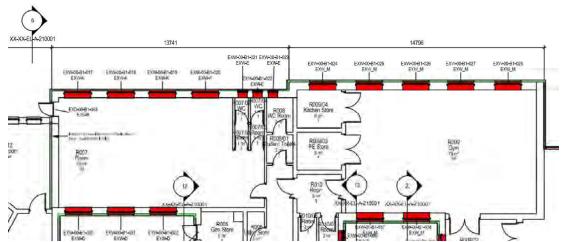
Proposed Plan showing proposed external wall insulation to front of school (in green).
